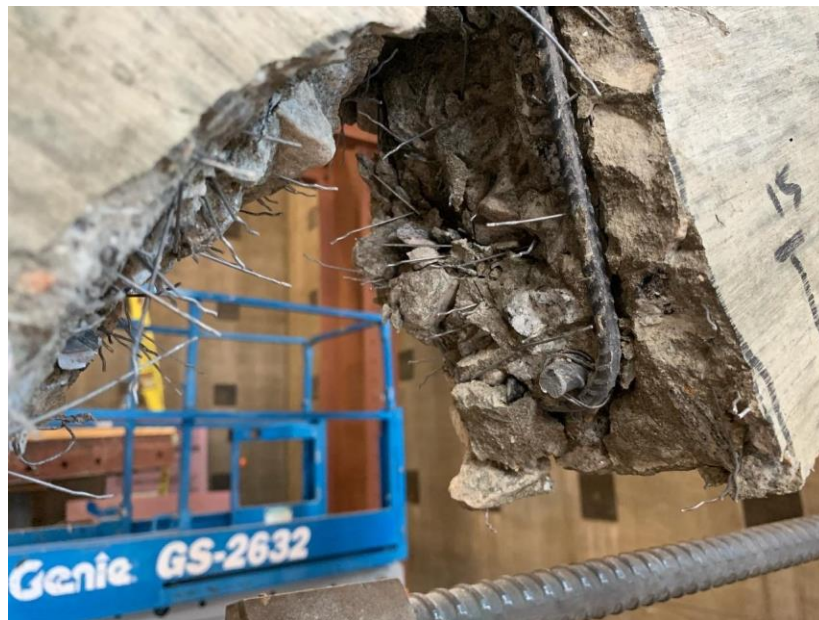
Cross-Section of Yielded Flexural Steel in Beam B6
